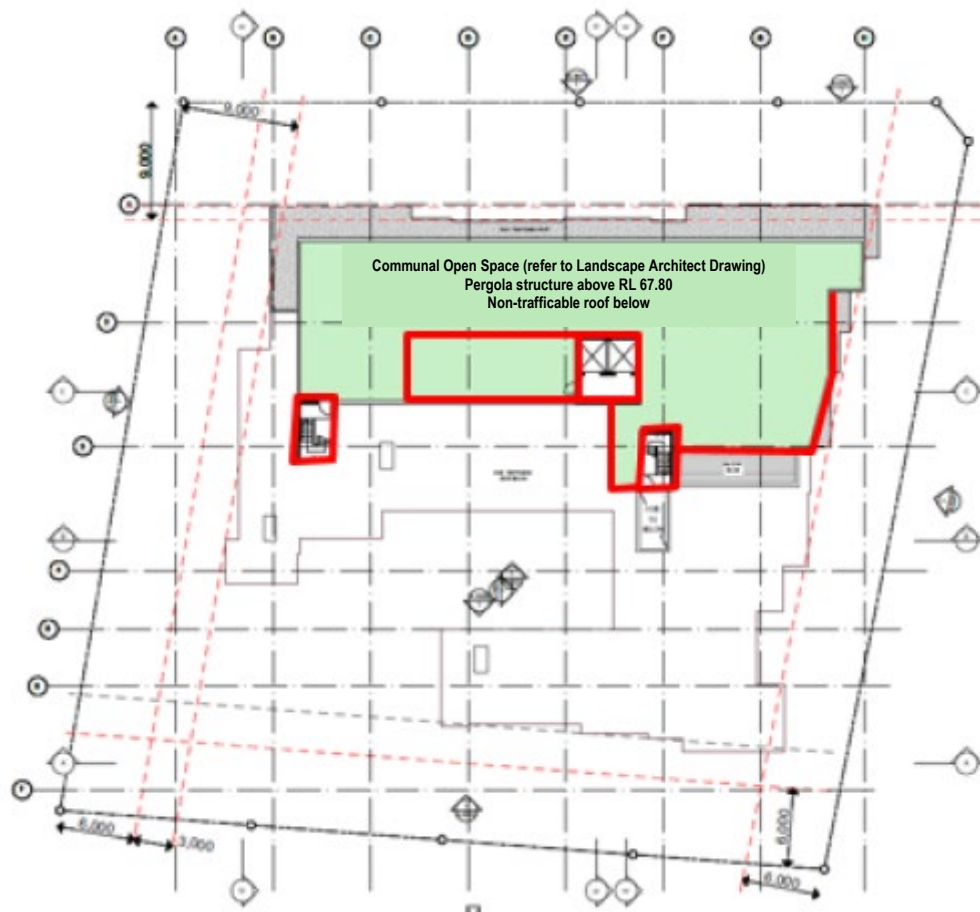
Roof plan - location and size of non-complying elements (outlined in red)
